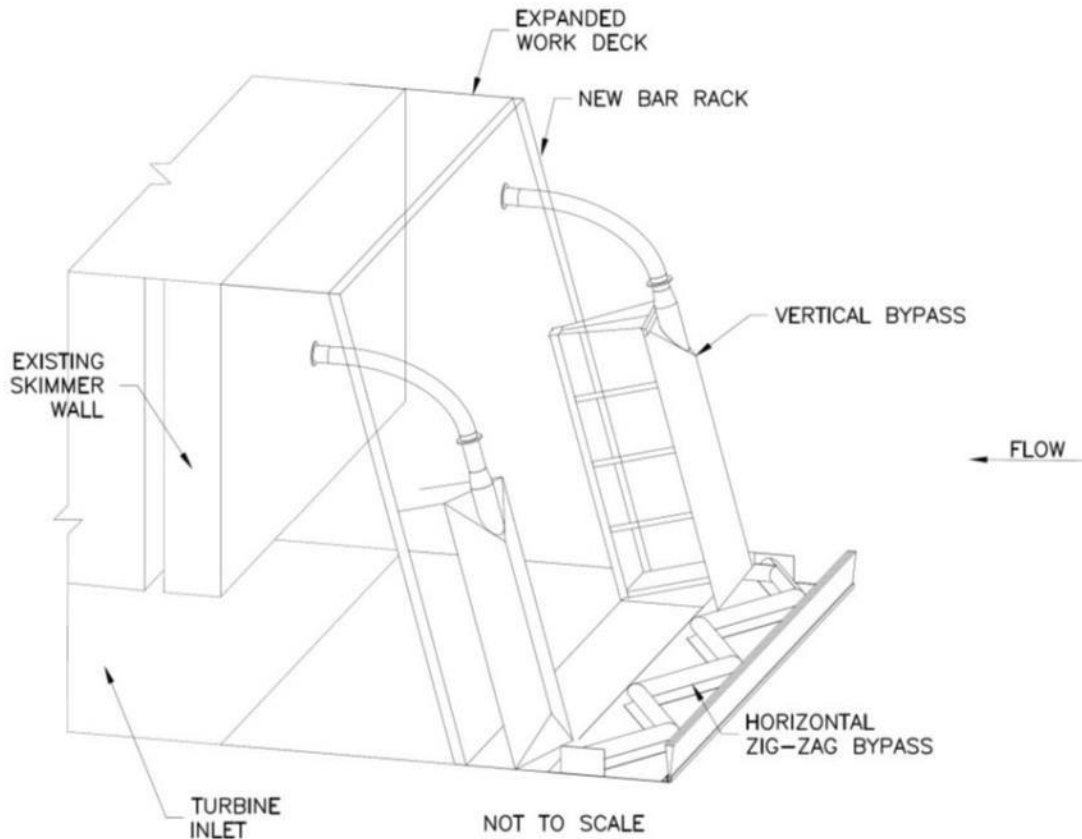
Conceptual design of vertical and horizontal zig-zag bypasses installed at Worumbo (isometric view).
